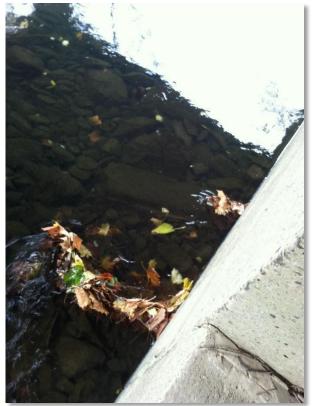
Scour formation under Bushkill Creek retaining wall. Photo taken November 7<sup>th</sup>.
